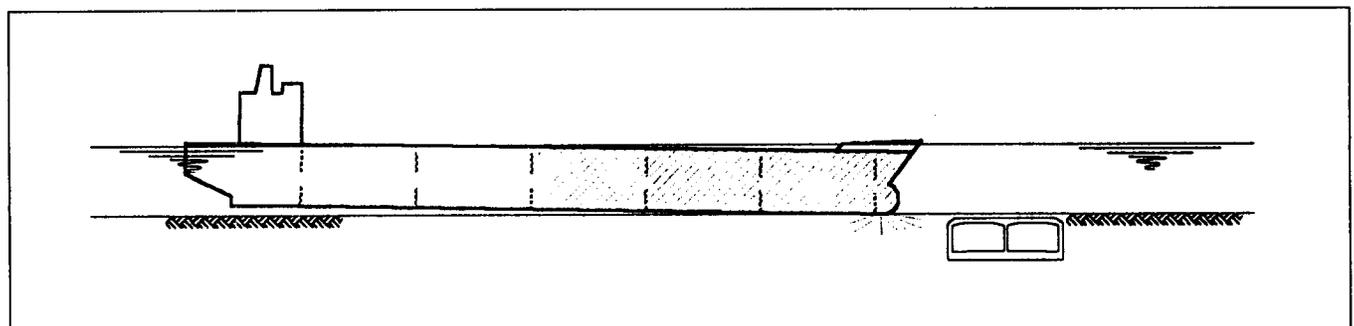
Ship grounding adjacent to an immersed tunnel, causing lateral pressure.
